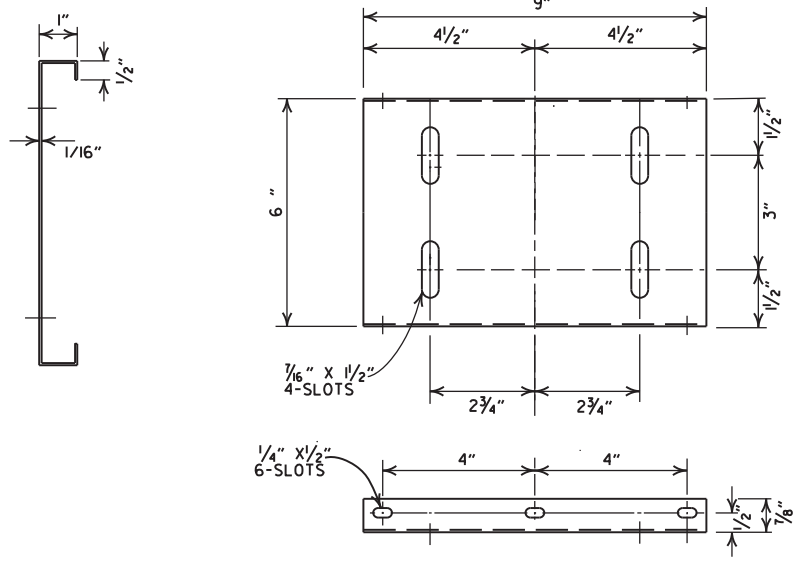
DETAIL OF TERMINAL ANCHOR POST (TYPE I)
